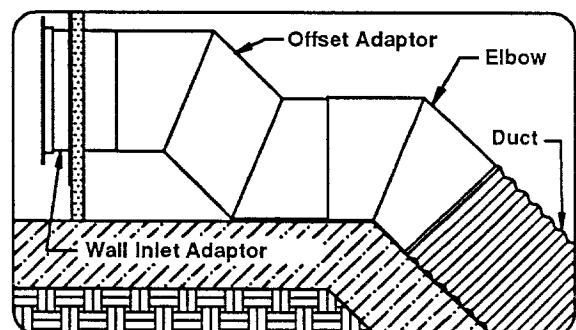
Typical Duct Elevation with Offset Adaptor and Elbow
